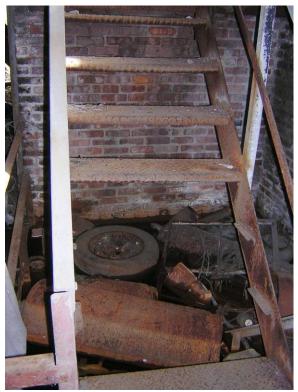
Damaged Interior Metal Stairs at 1st Floor of Three-Story Building
